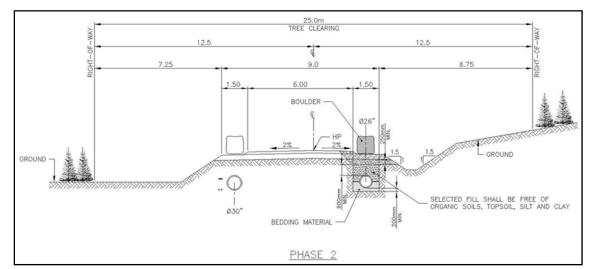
Typical Cross-Section of PDS Installation along Pipe Bench, Phase 2
